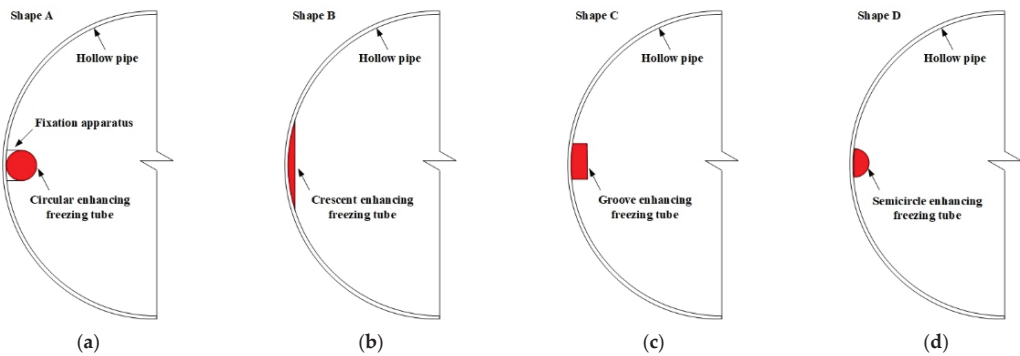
Cross-sectional shapes of enhancing freezing tubes: circular tube (a); crescent tube (b); groove tube (c); semicircular tube (d).
